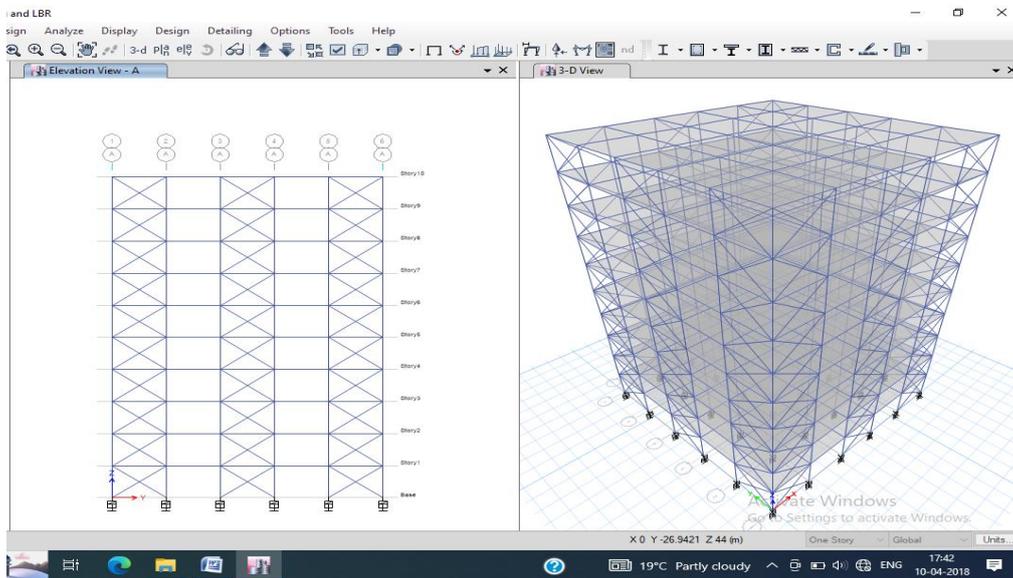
Front View And Elevation Of Building With X-Steel Bracing
